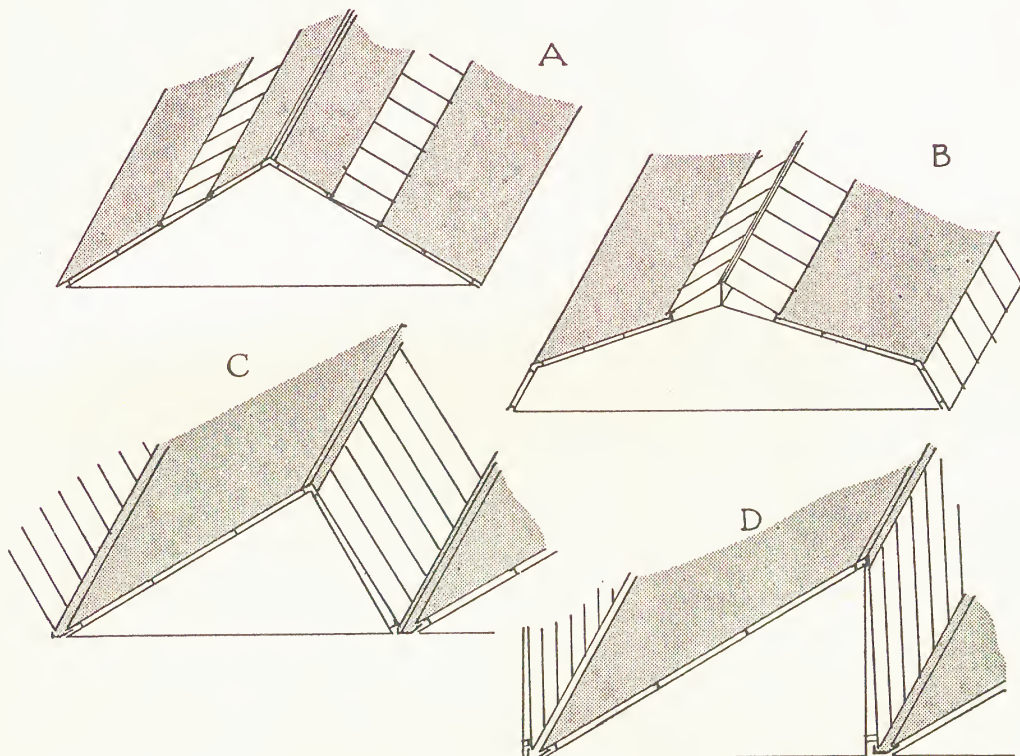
Roof glazing : typical arrangements. C and D are north-light roofs.
